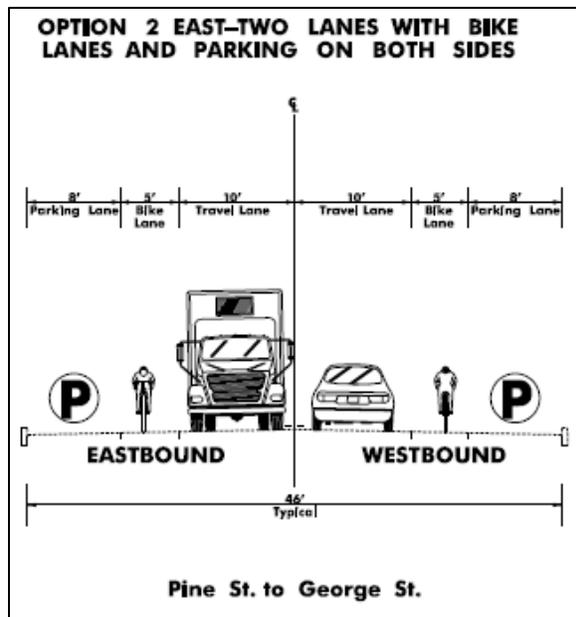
Two-Lane Roadway Cross Section with Bike Lanes and Parking on Both Sides – East
